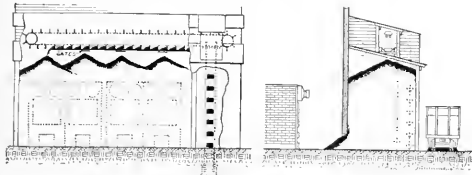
BUCKET ELEVATOR AND HORIZONTAL CONVEYOR TO DISTRIBUTE COAL
